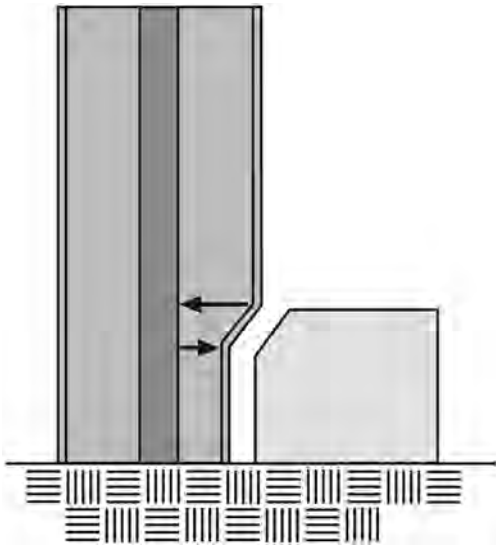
Illustration of building geometry resulting in gravity-induced shear forces.
